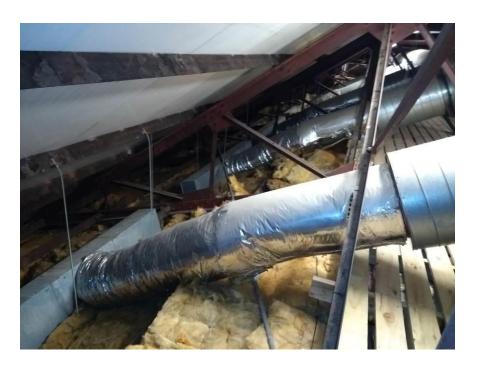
Loft over vaulted ceiling -vent ducts, no timber decking for access.
